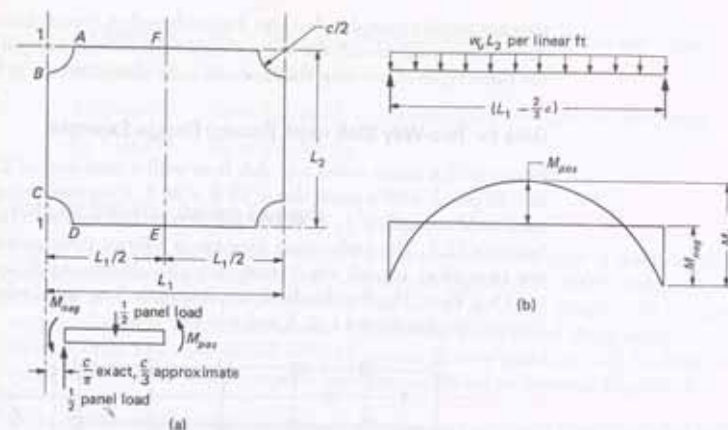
Statics of a typical interior panel in a flat slab floor system.
